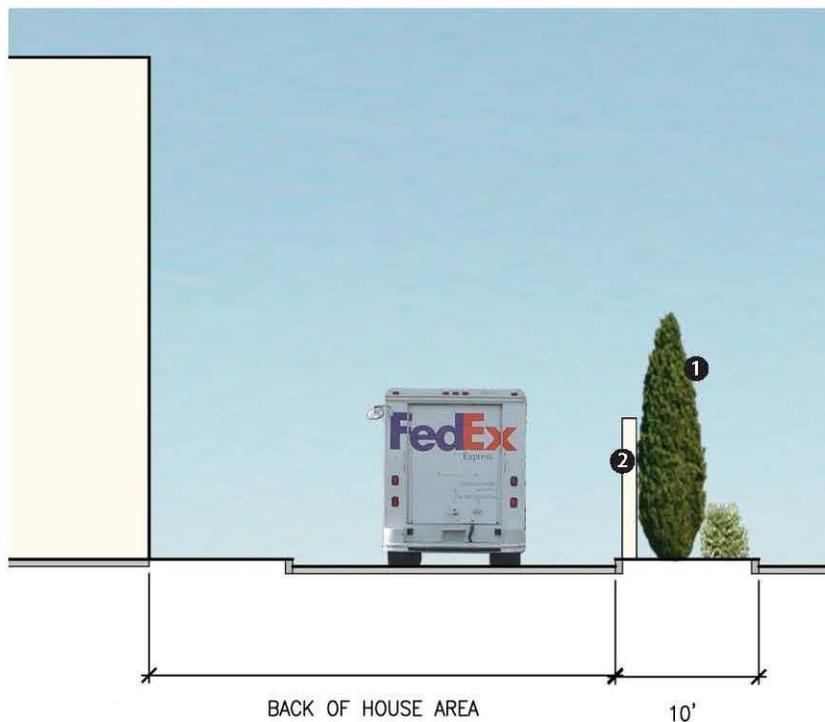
Minor Retail Tenant Back of House Screening
